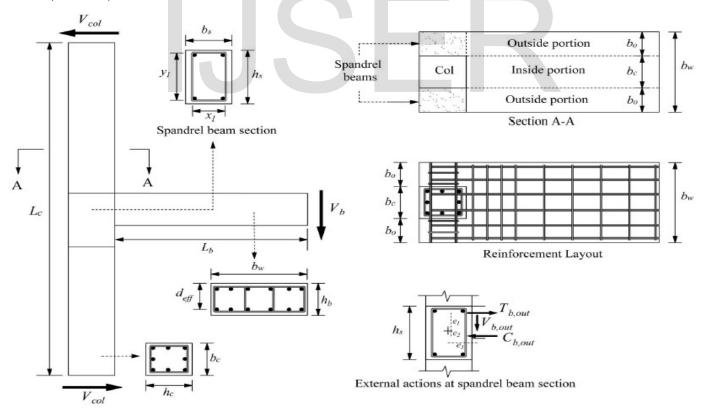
shows a statically determinate exterior wide beamcolumn connection with a column of size bcx hcx Lc and a wide beam of size bwx hbx Lb. The wide beam can be subdivided into three parallel parts. The inside portion is connected di rectly to the joint, whereas the two outside portions are attached to the joint through the spandrel beam of size bsx hsx bo. Some of the longitudinal beam reinforcements are located at the outside portions (fig.3). These bars are anchored in the spandrel beams on two sides of the column. According to the weak beam–strong column concept, under the action of a lateral load plastic hinge damage is developed in the beam at the column face.
